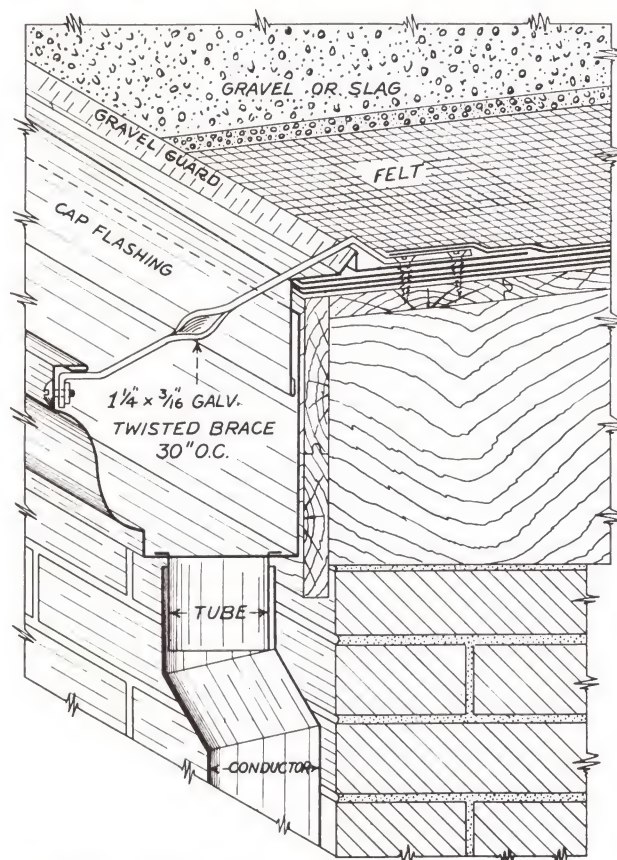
HANGING GUTTER WITH COMBINATION CAP FLASHING
